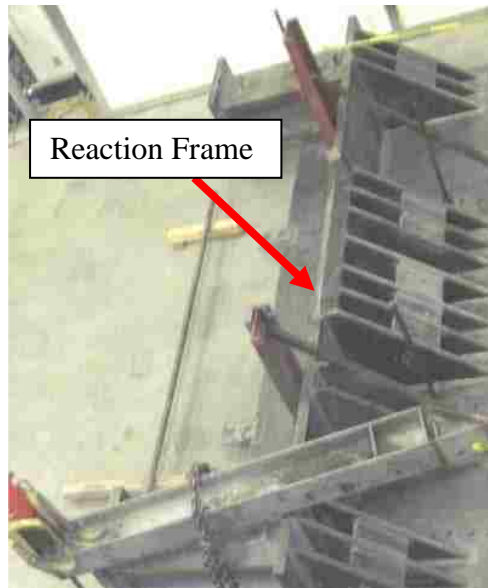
Photo of Steel Reaction Frame for Tests to Failure (From Above)
